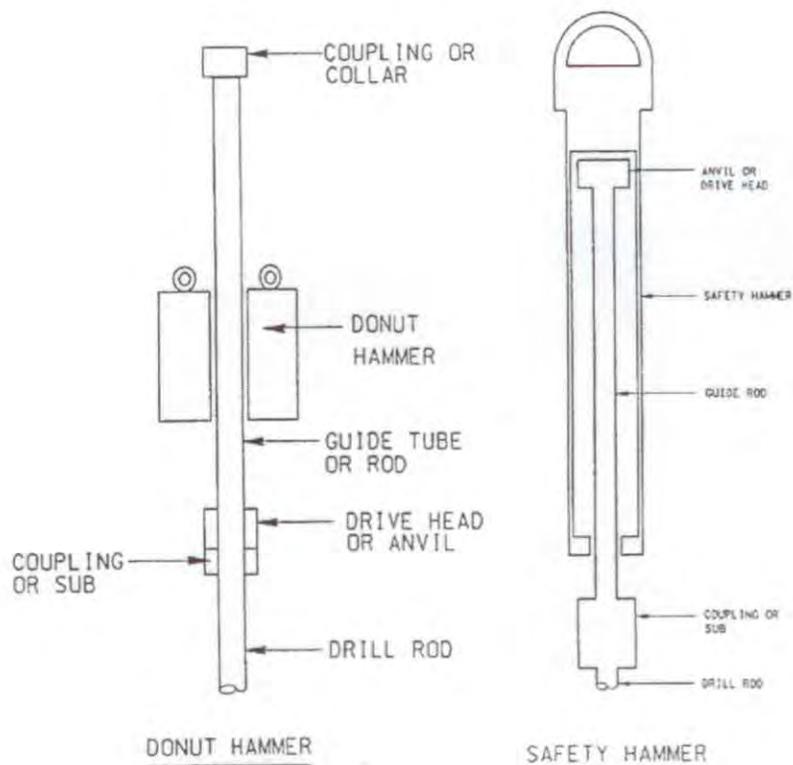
Schematic Drawing of the Donut Hammer and Safety Hammer
